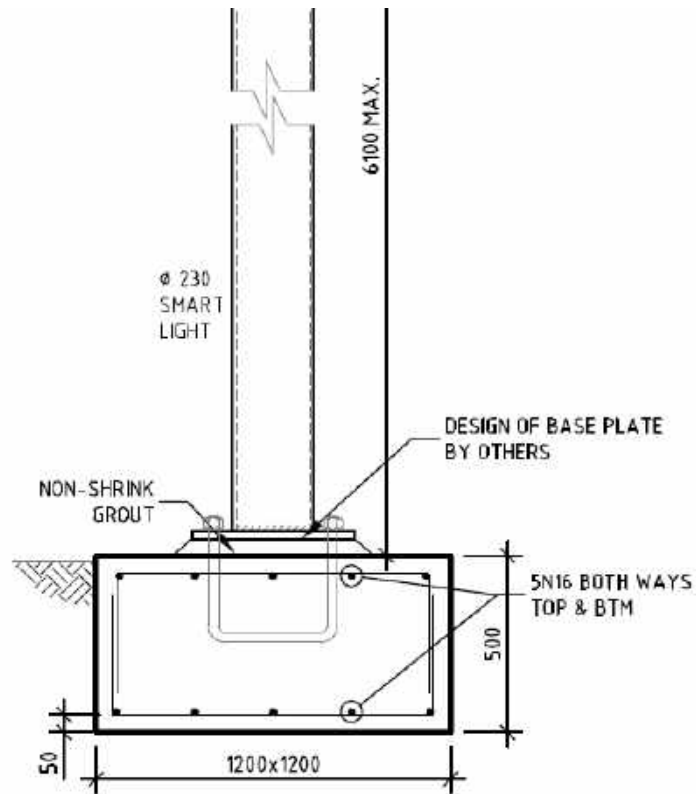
Typical footing detail. Source: drawings provided by Edward Bennett dated 6 May 2020 (Appendix A).
